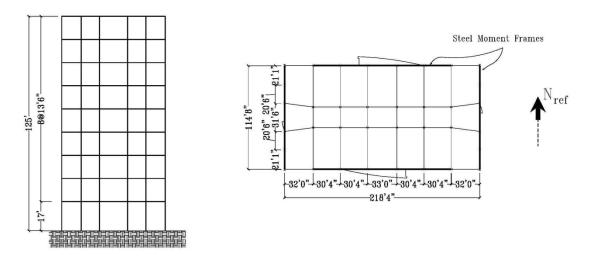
Elevation of typical steel moment frame (N-S Direction) and floor plan of the building
